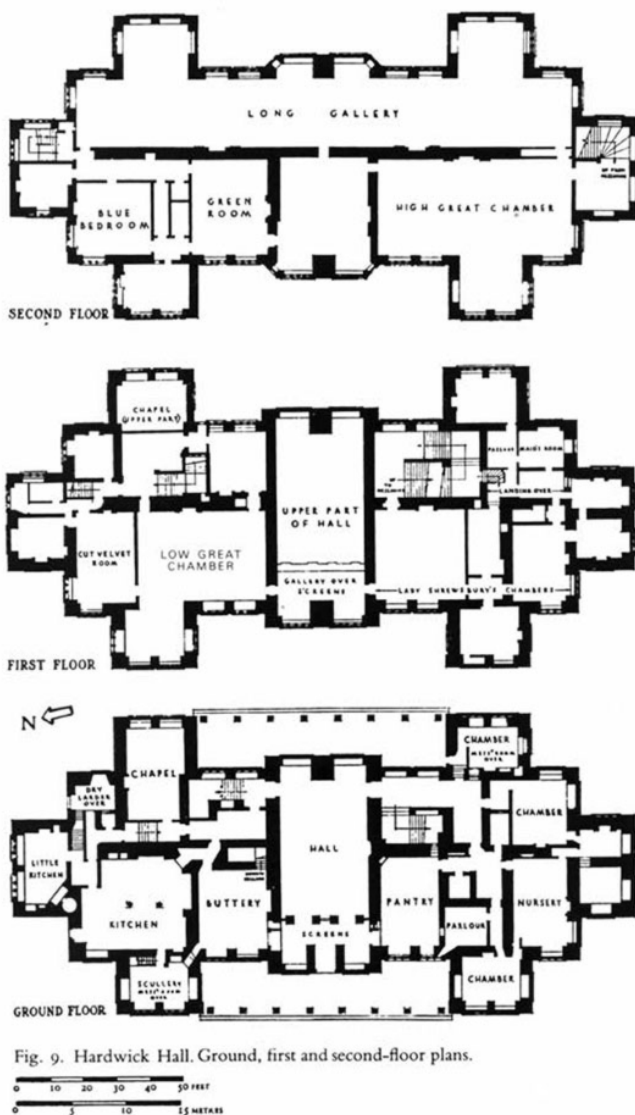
Hardwick Hall. Ground, first and second-floor plans.
